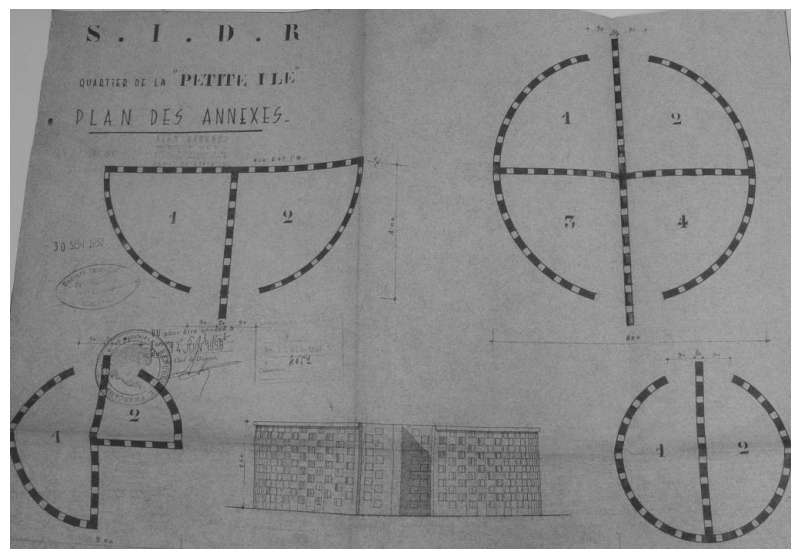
No more animal husbandry: roofless concrete outbuildings
